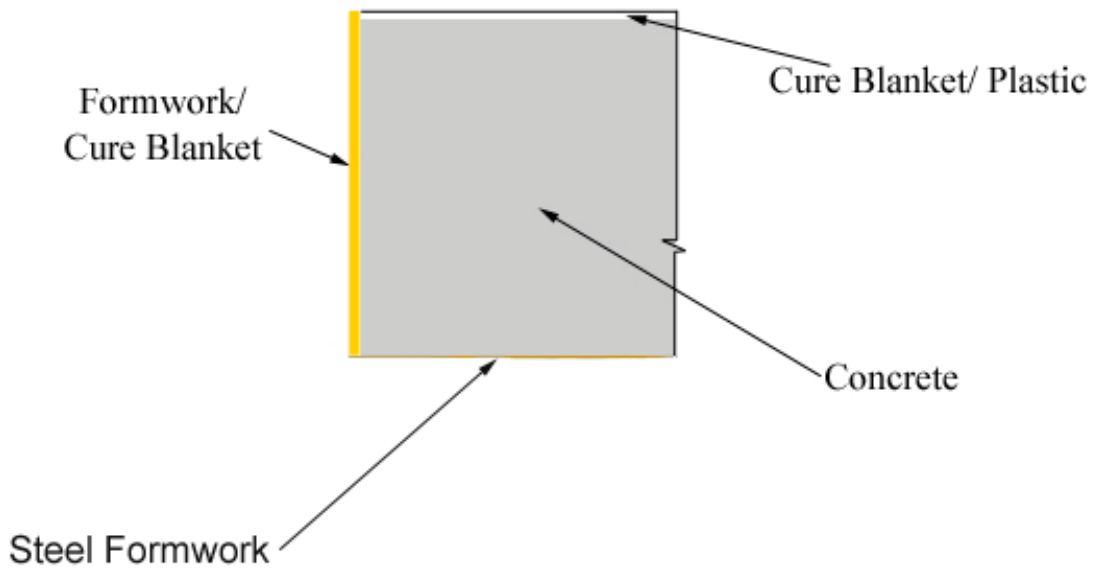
ConcreteWorks simplified model for rectangular and U-shaped beams
